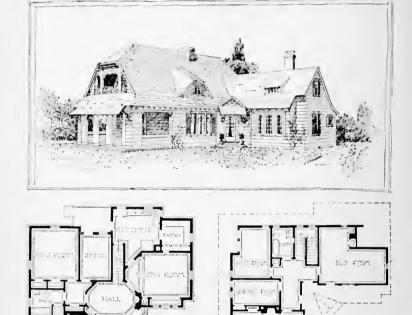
A farmhouse plan, showing diagonal corners used deliberately for purpose of design.
